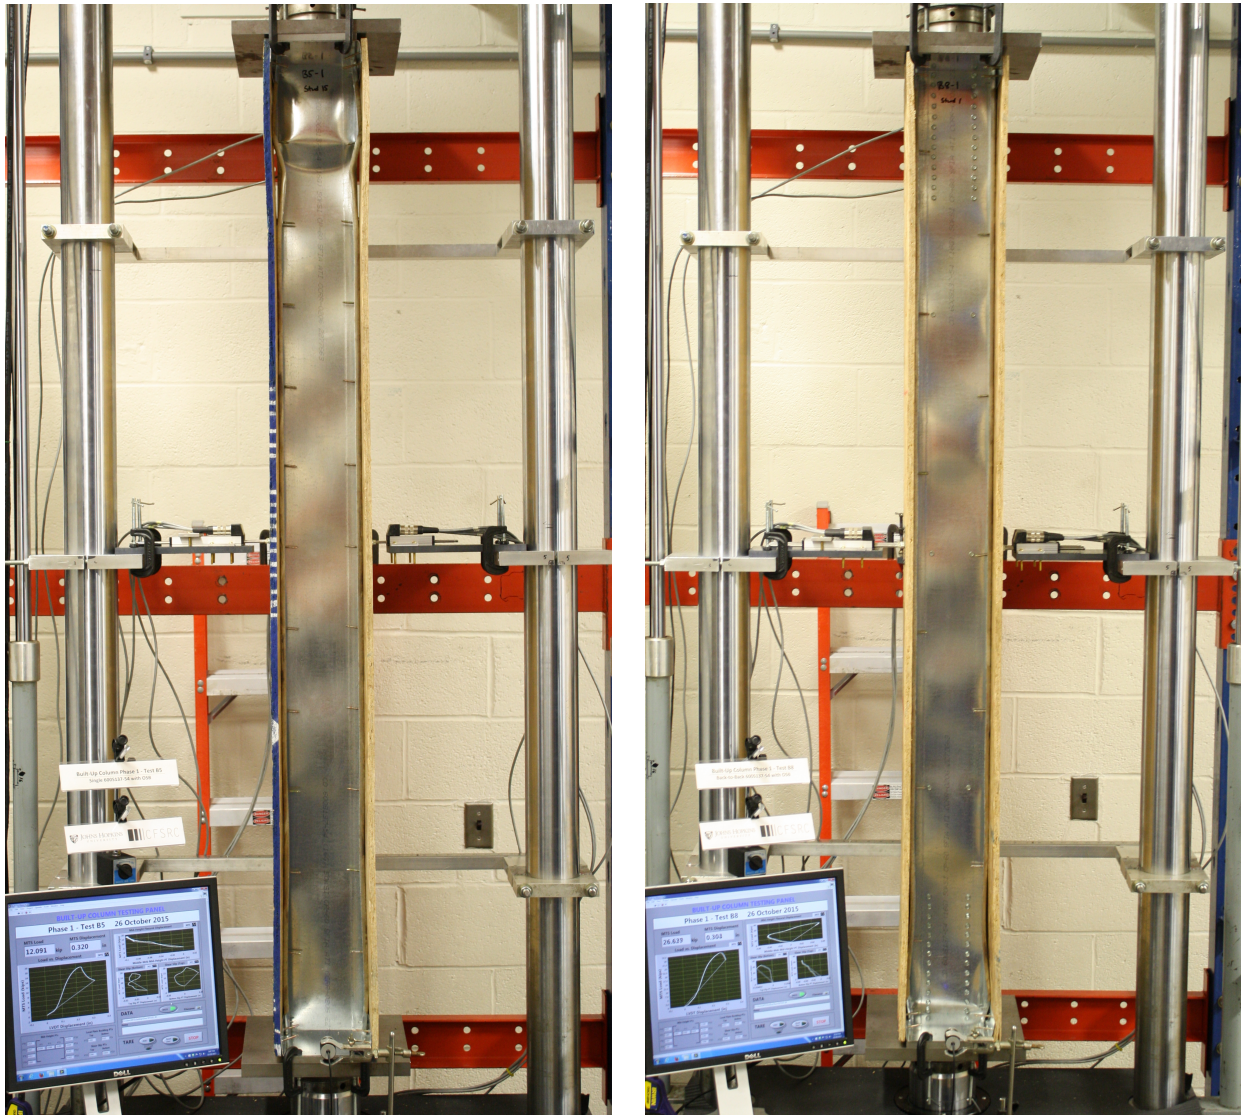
Typical single stud (left, trial B5) and built-up column (right, trial B8) web local buckling failures
